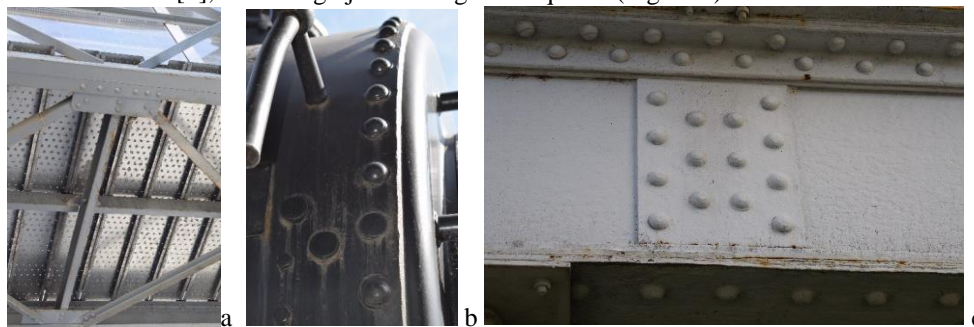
Riveted joints: a) bridges, b) entertainment steam engine locomotive; c) structural support
